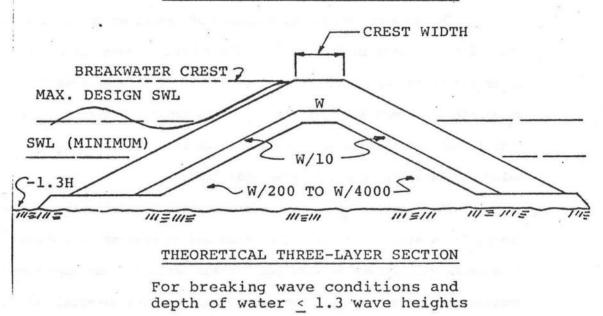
Typical Shallow Rubble-Mound Breakwater Section
